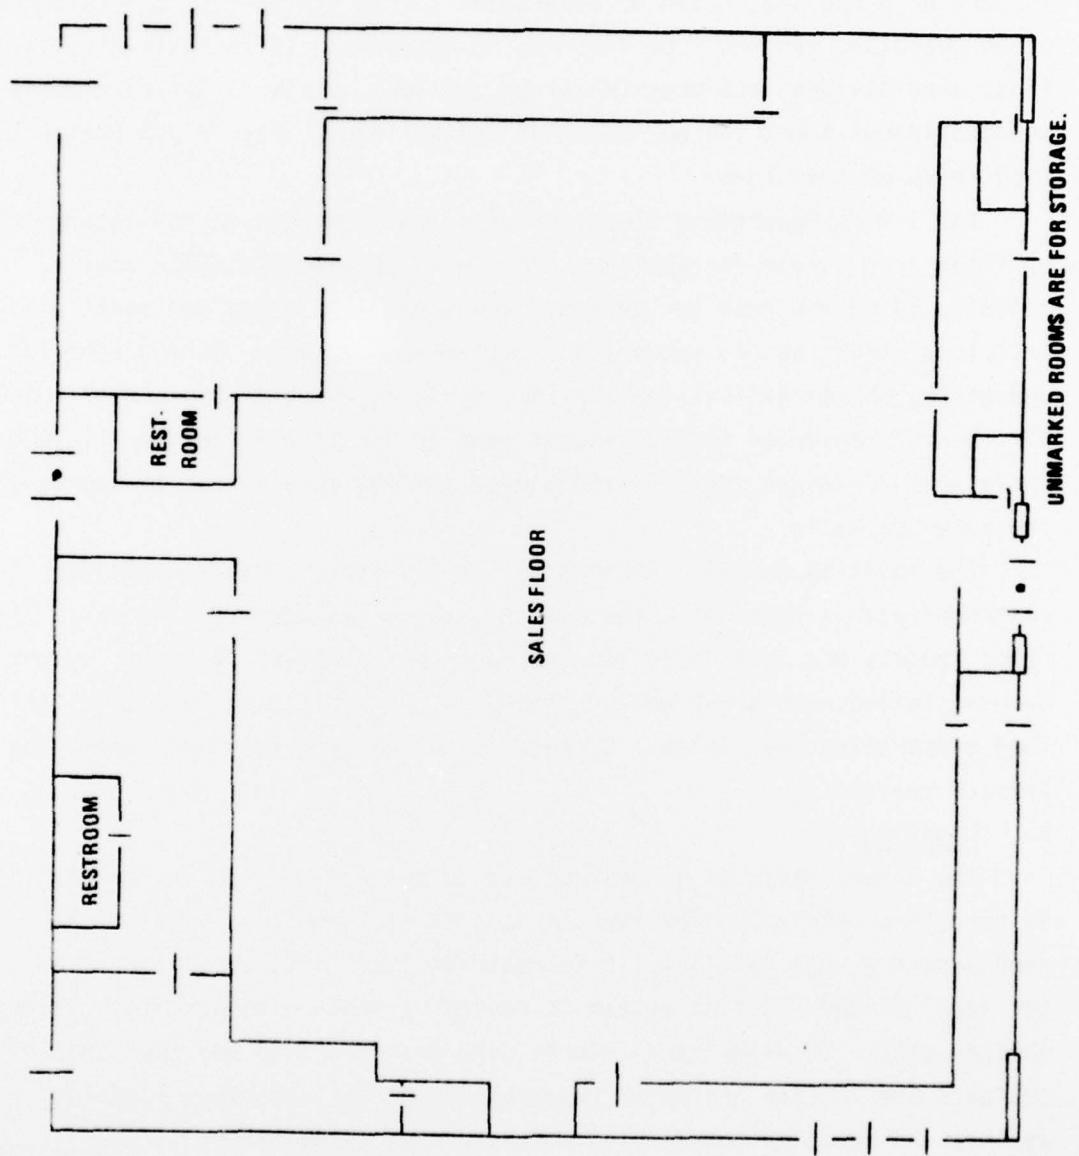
FLOOR PLAN OF S-MART DEPARTMENT STORE
